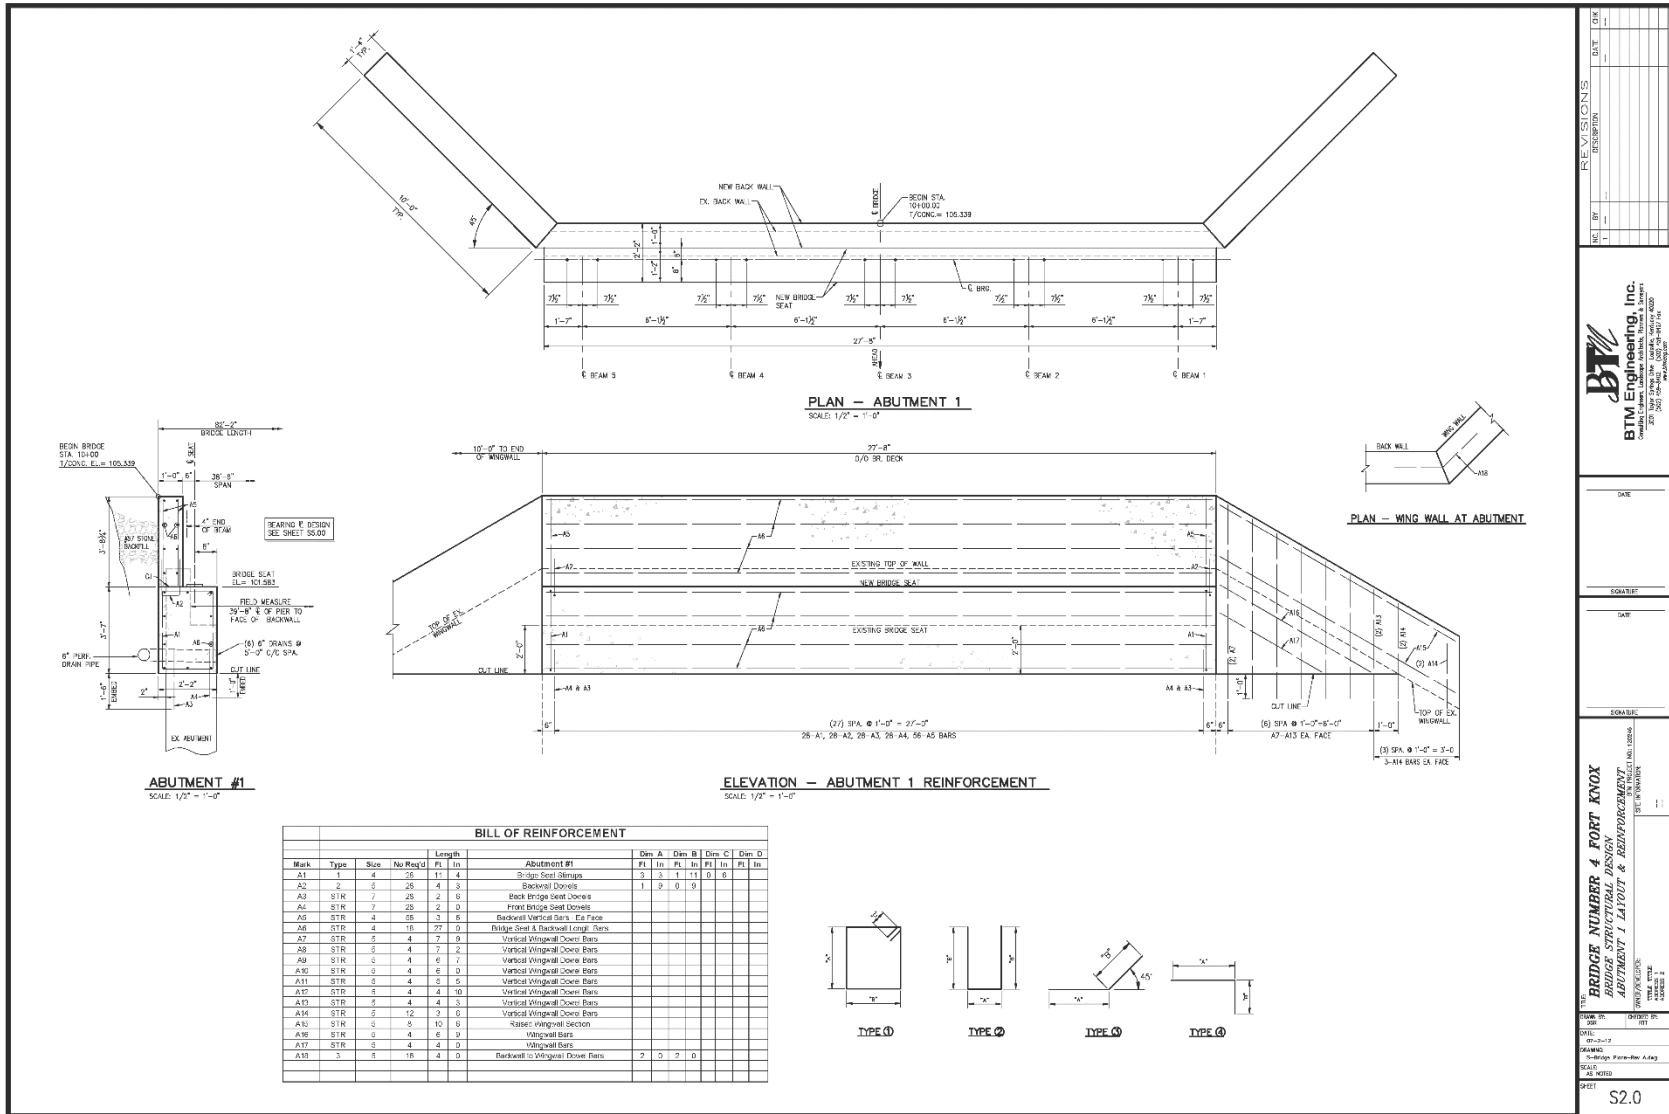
Engineer drawing for Abutment 1 on Bridge No. 4, Fort Knox.
